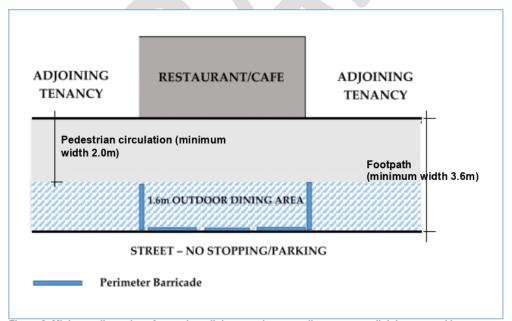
Minimum dimensions for outdoor dining <u>on primary retail streets</u> not adjoining car parking.
